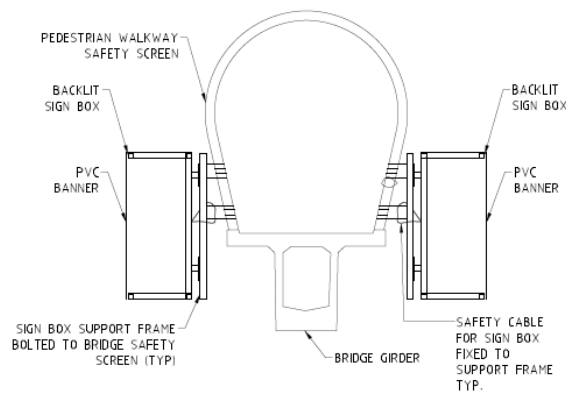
Elevation B Plan - Facing Eastbound Traffic
